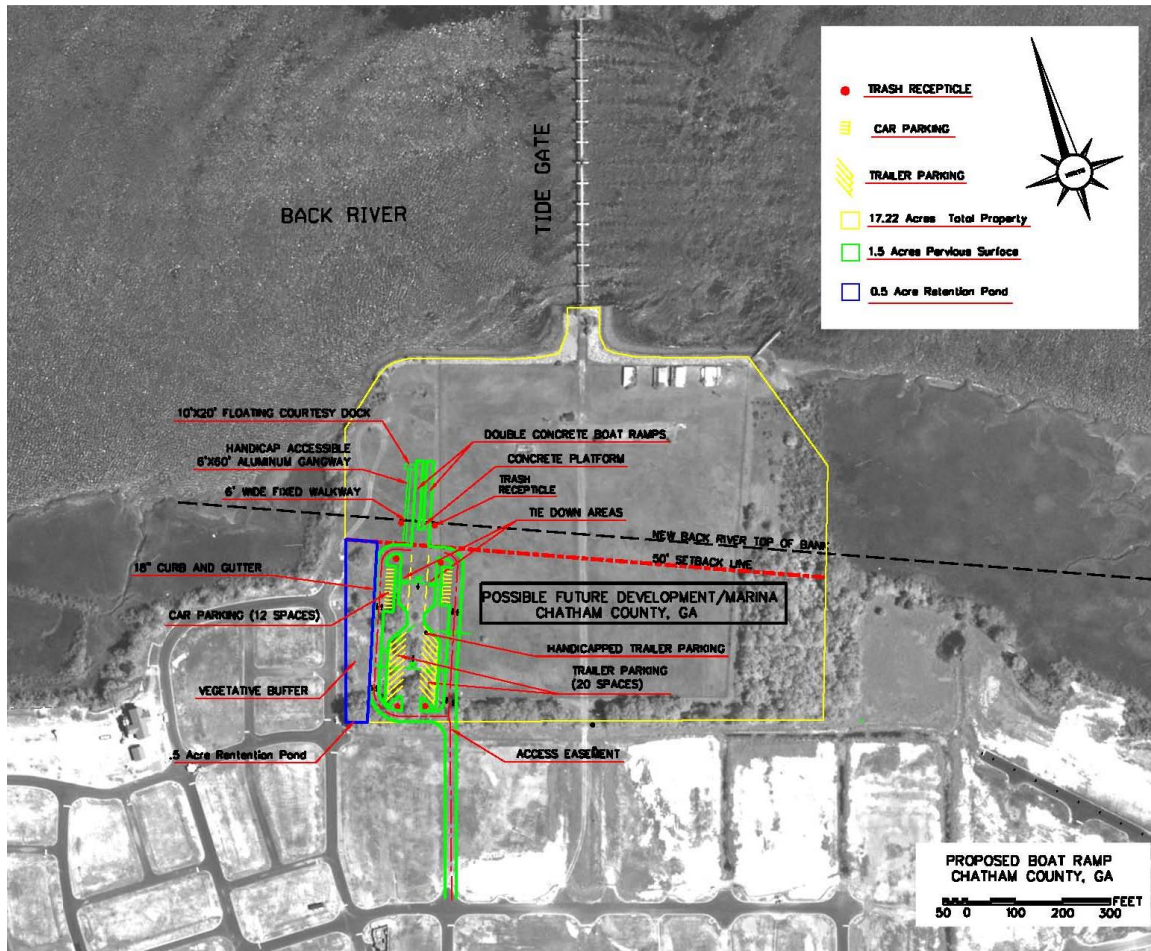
Proposed Hutchinson Island Boat Ramp
